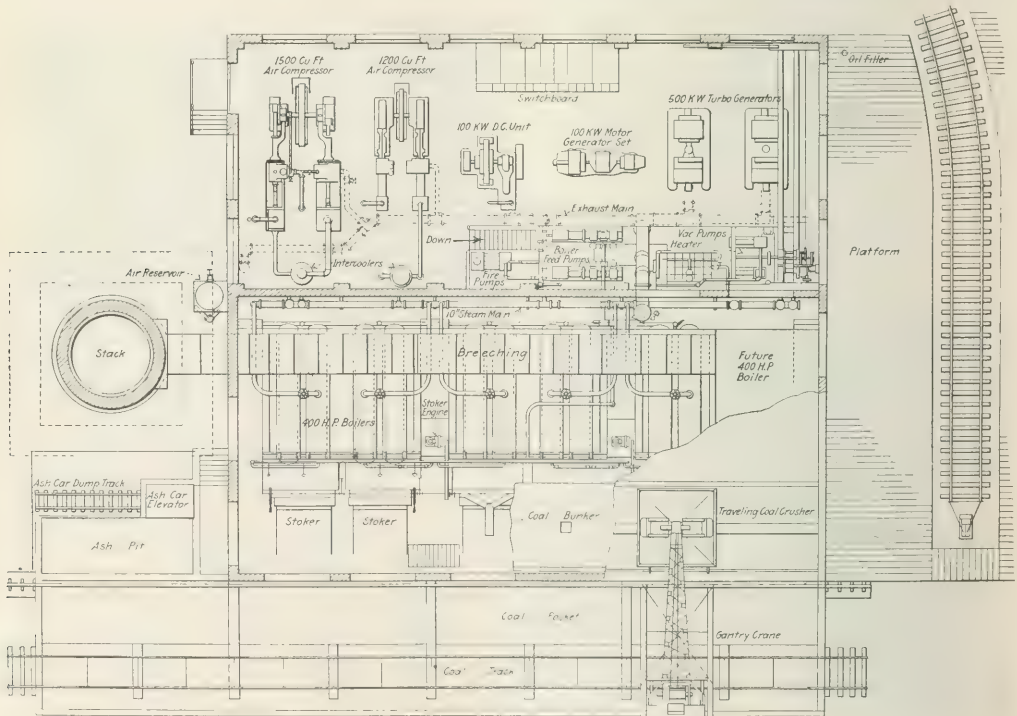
GENERAL PLAN OF THE POWER HOUSE
